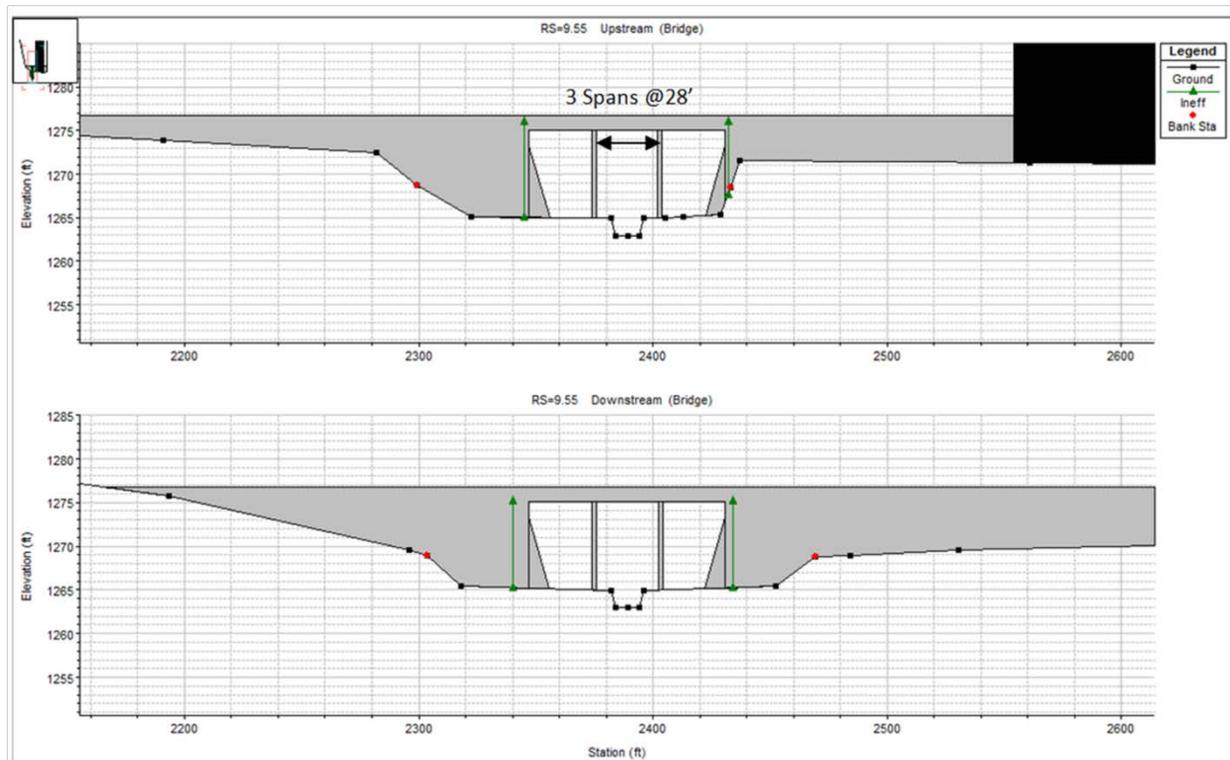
Cross-Sections of Design Option 3 for Culvert 5722
